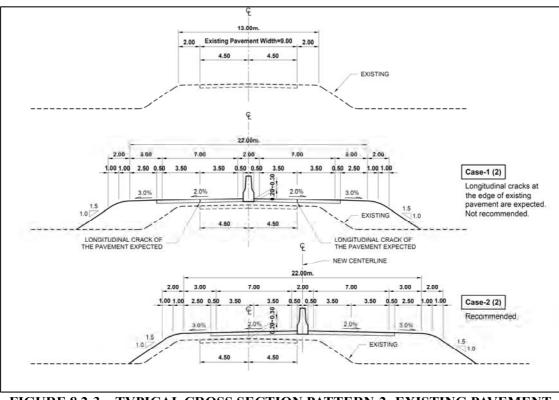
TYPICAL CROSS SECTION PATTERN-2: EXISTING PAVEMENT WIDTH=9.00M.
